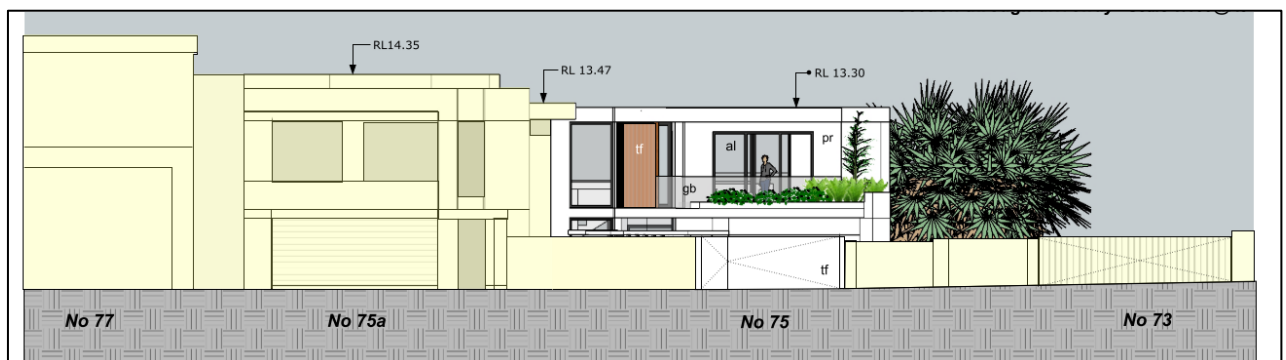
Front elevation showing proposal in relation to adjoining properties
